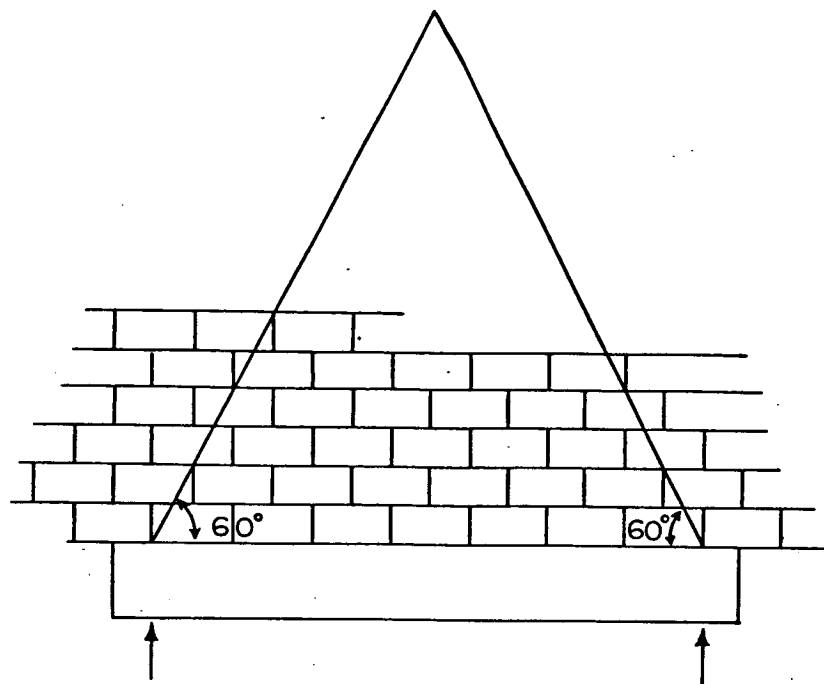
ASSUMED DESIGN LOADING FOR SUPPORTING BEAM.
